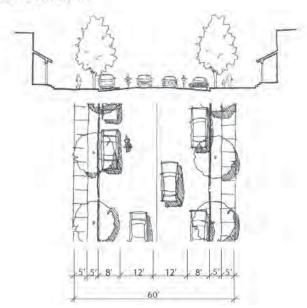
G - STREET SECTIONS - FORD BOULEVARD
